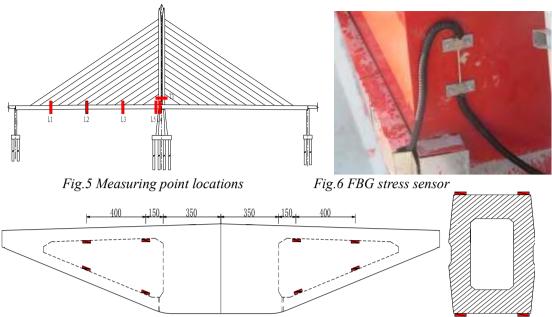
Sensor deployment at the steel-concrete part and the pylon root
